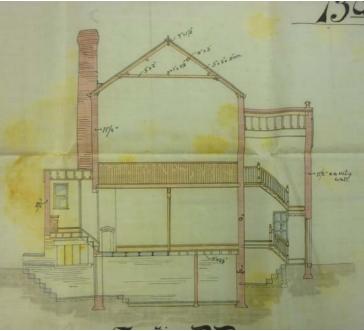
(left): Proposed rear (north-east) elevation (CRO(B) Building Control 3237 1894)
